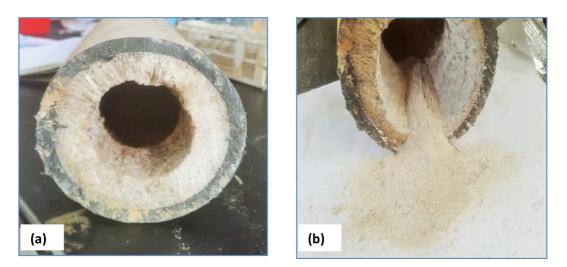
(a) A section of the piping system (b) Struvite formed as clogs on the pipe being scrapped out.
